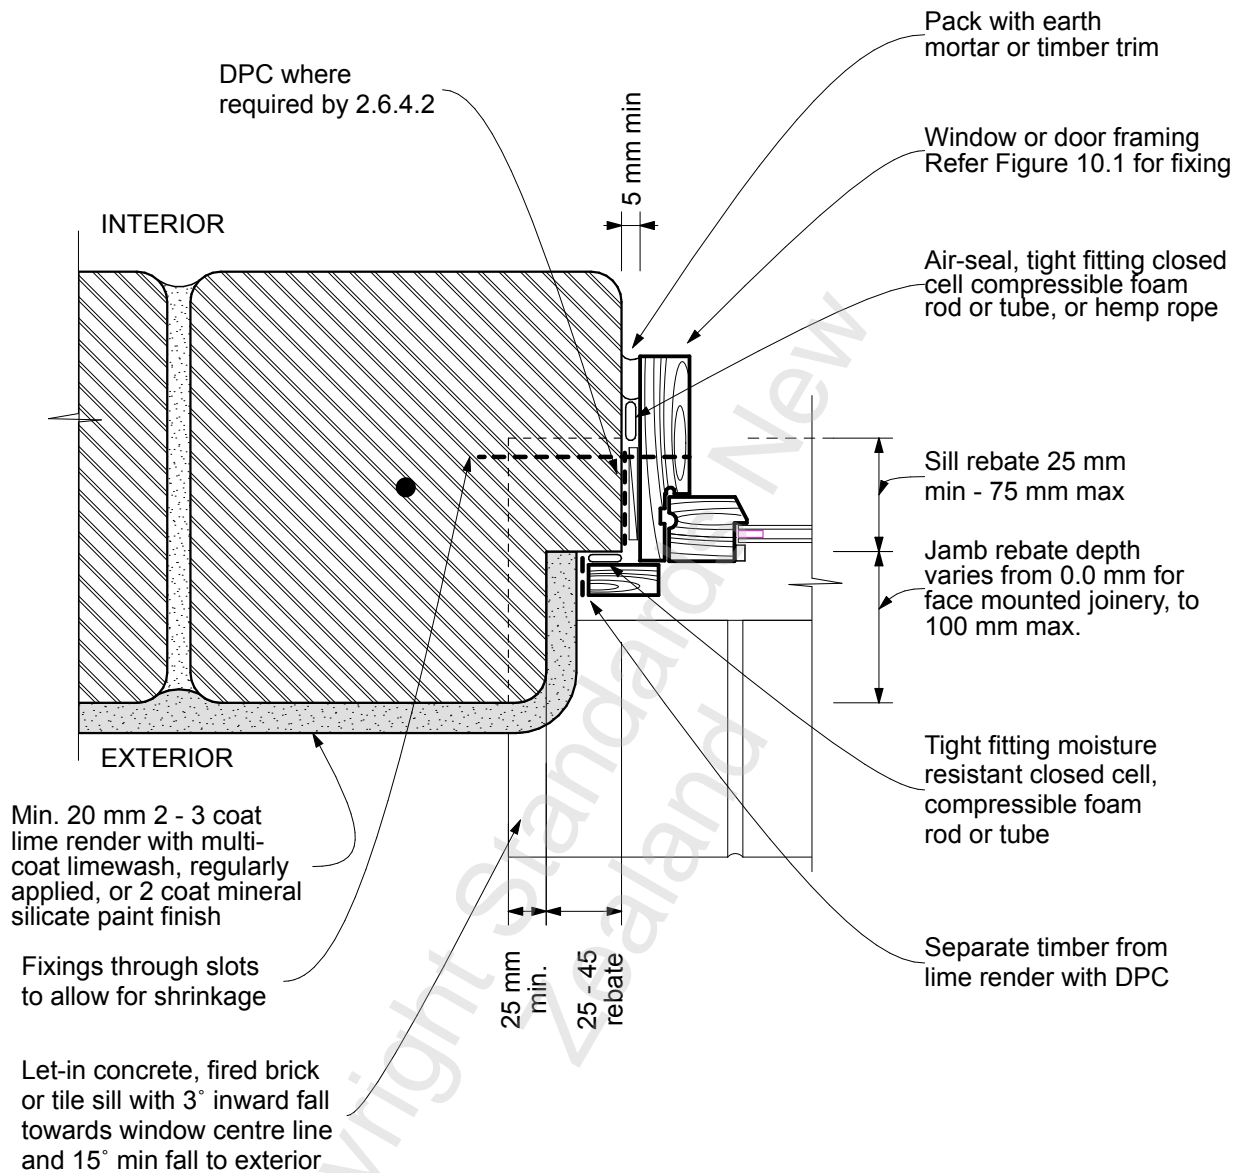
Timber joinery jamb for lime plaster over solid earth wall
